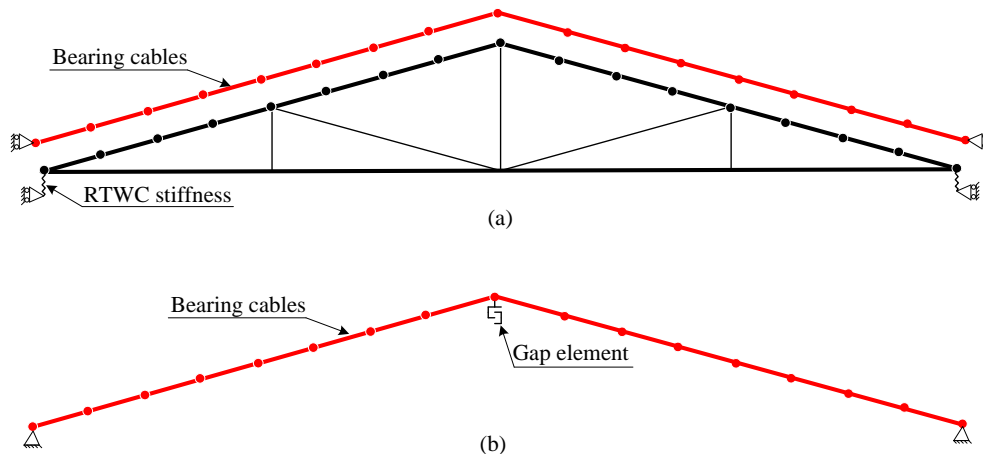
Support segments: (a) an A segment, which is a truss with bearing cable; (b) a B segment, which is a bearing cable only.
